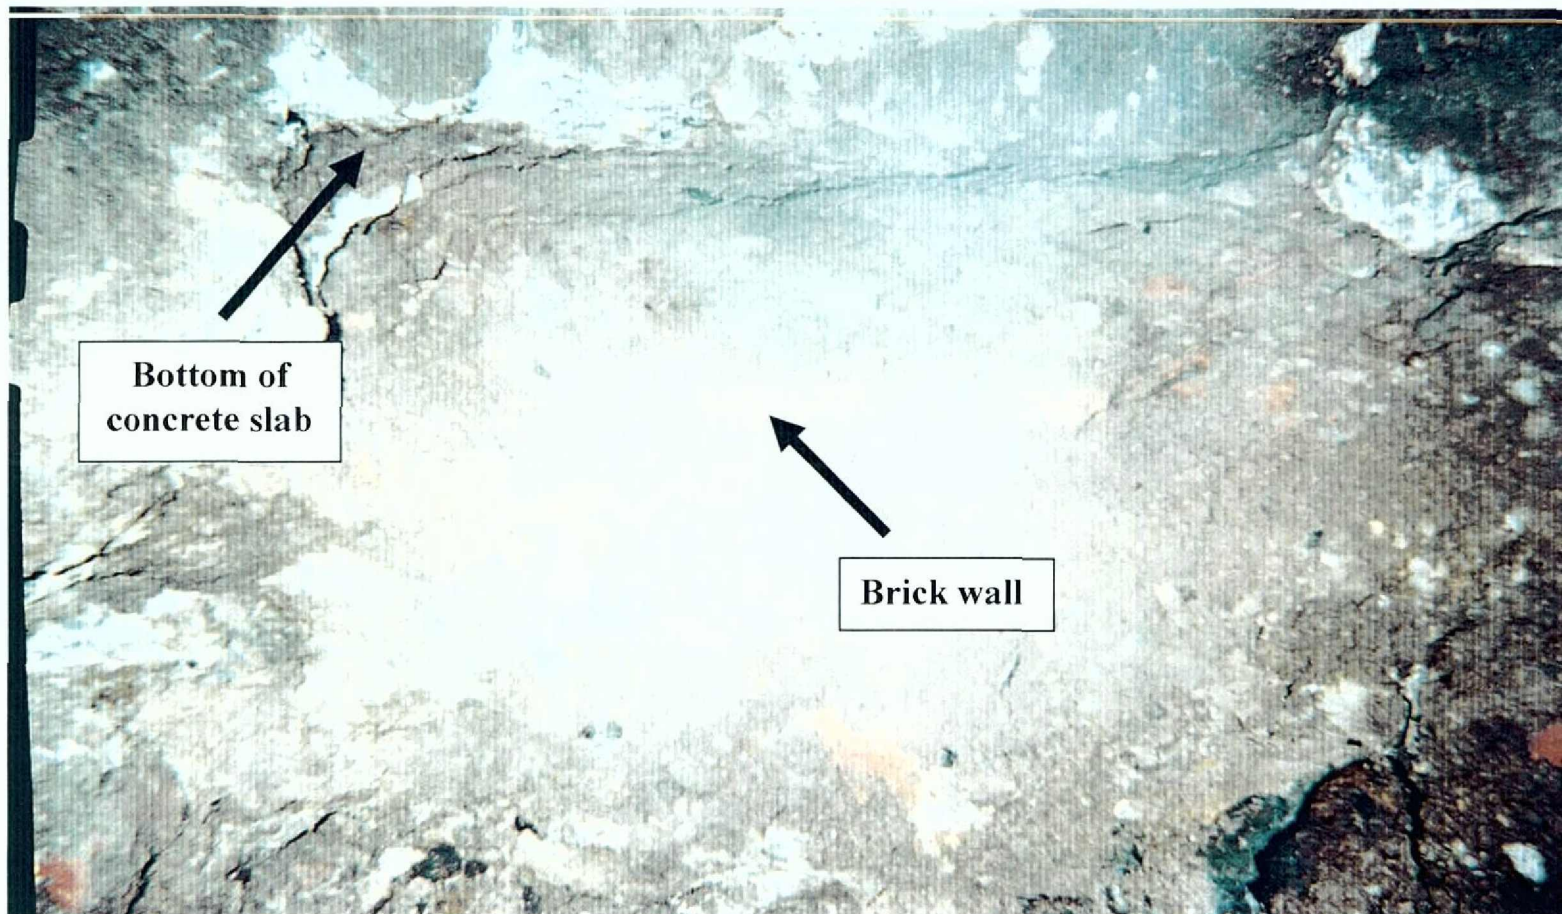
TP-9 (West pit): Facing East-Brick wall in the middle of TP-9.
